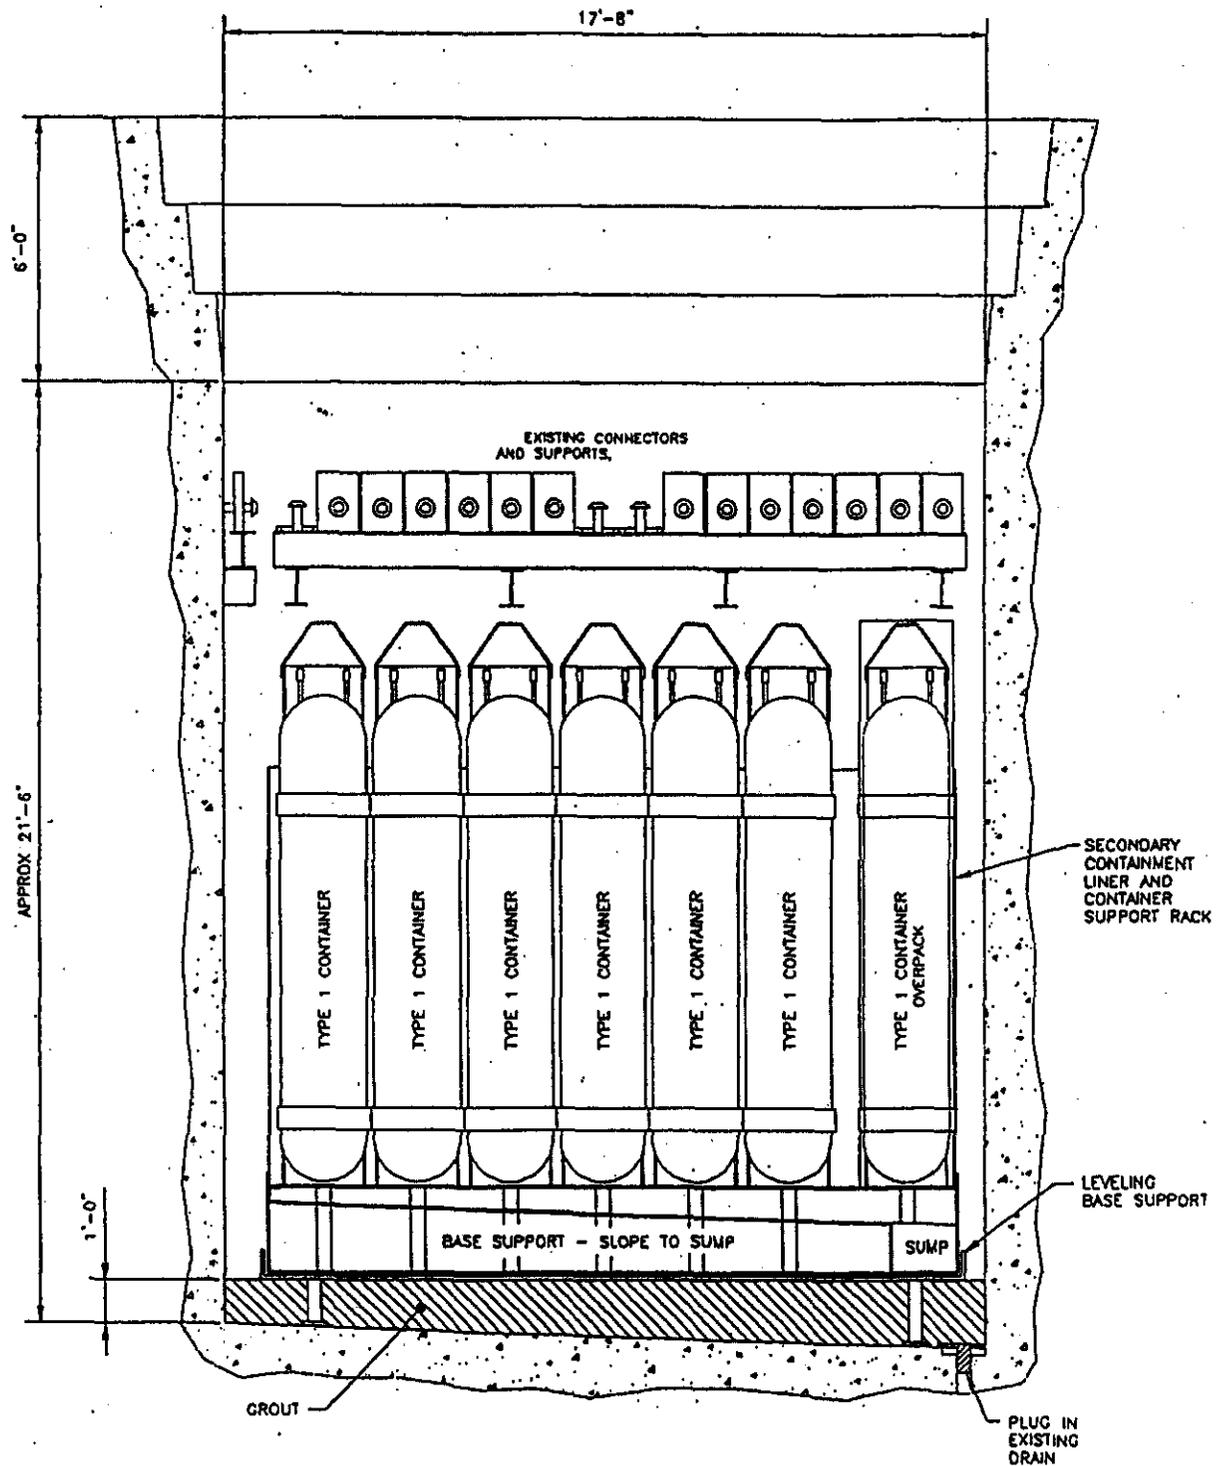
Typical Arrangement Type 1 Containers and Container Storage Rack for Dry Process Cell (Side View).
